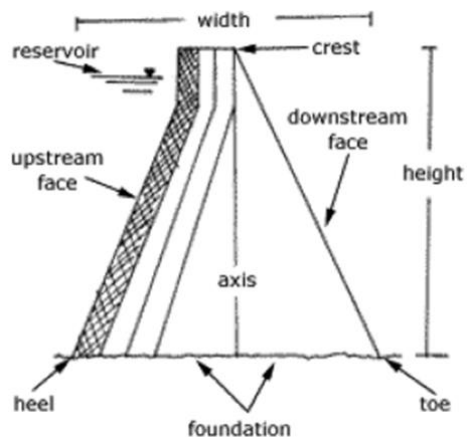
Gravity dam cross-section showing load transmission to foundation.
